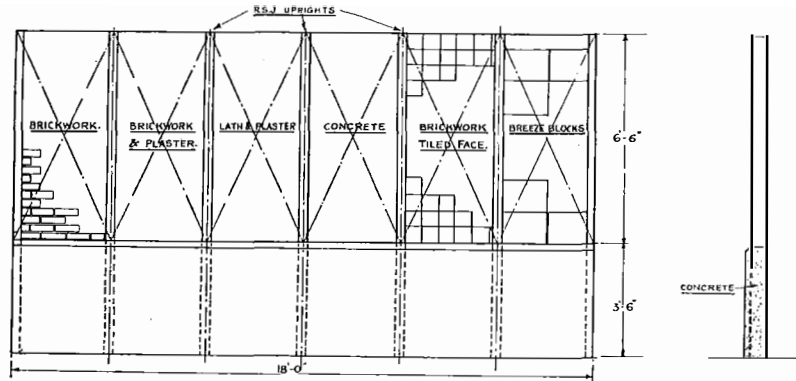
FRAME FOR WALL PLUGGING PRACTICE.
